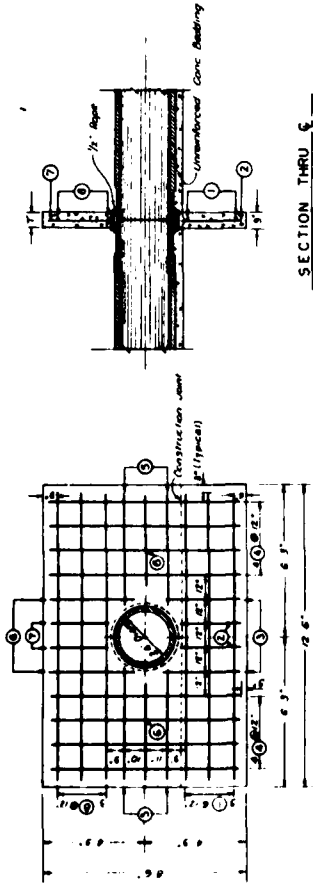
DETAIL OF SMALL ANNUAL BOARD AT OUTLET END OF 6" D.M. PIPE
